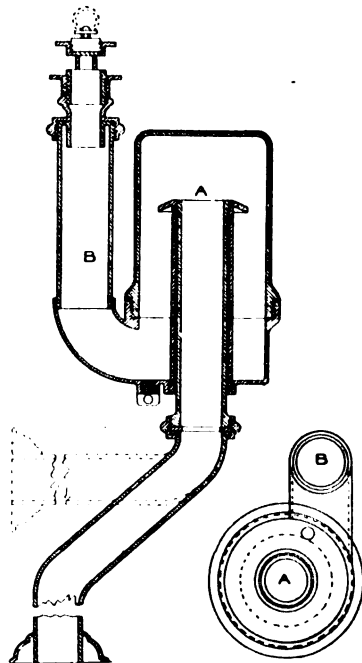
Lavatory Trap with Interior Flanged Weir. Weir is Double-Walled to Betray Leakage.
